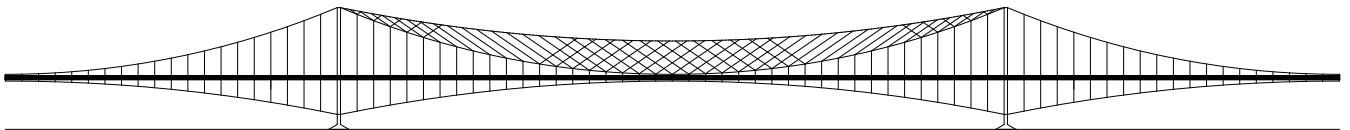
Rational Structure of Cable Truss for Suspension Bridge
